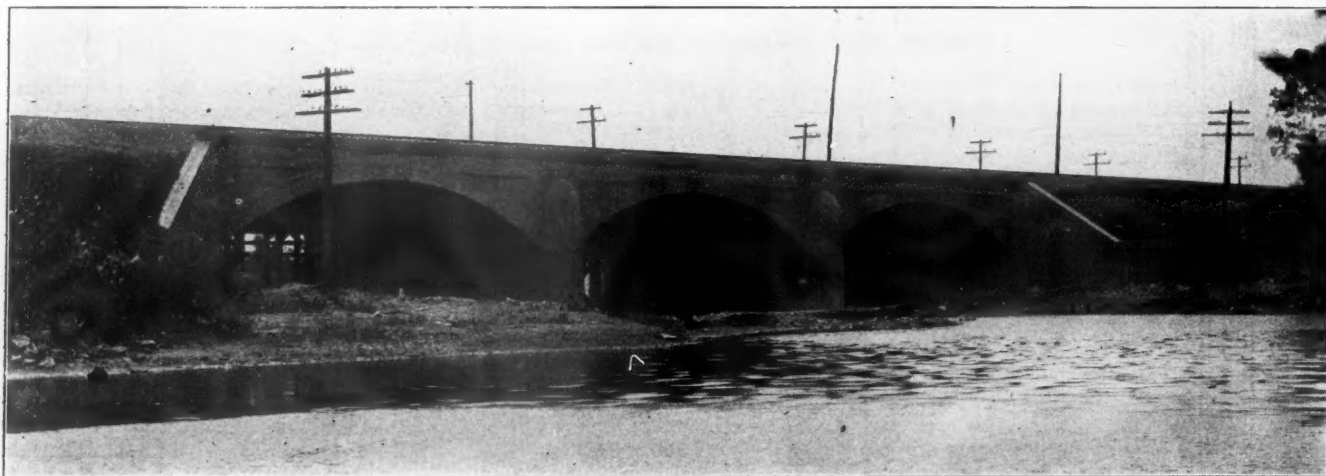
Concrete Arch Over Eagle Creek; Vandalia Track Elevation.
